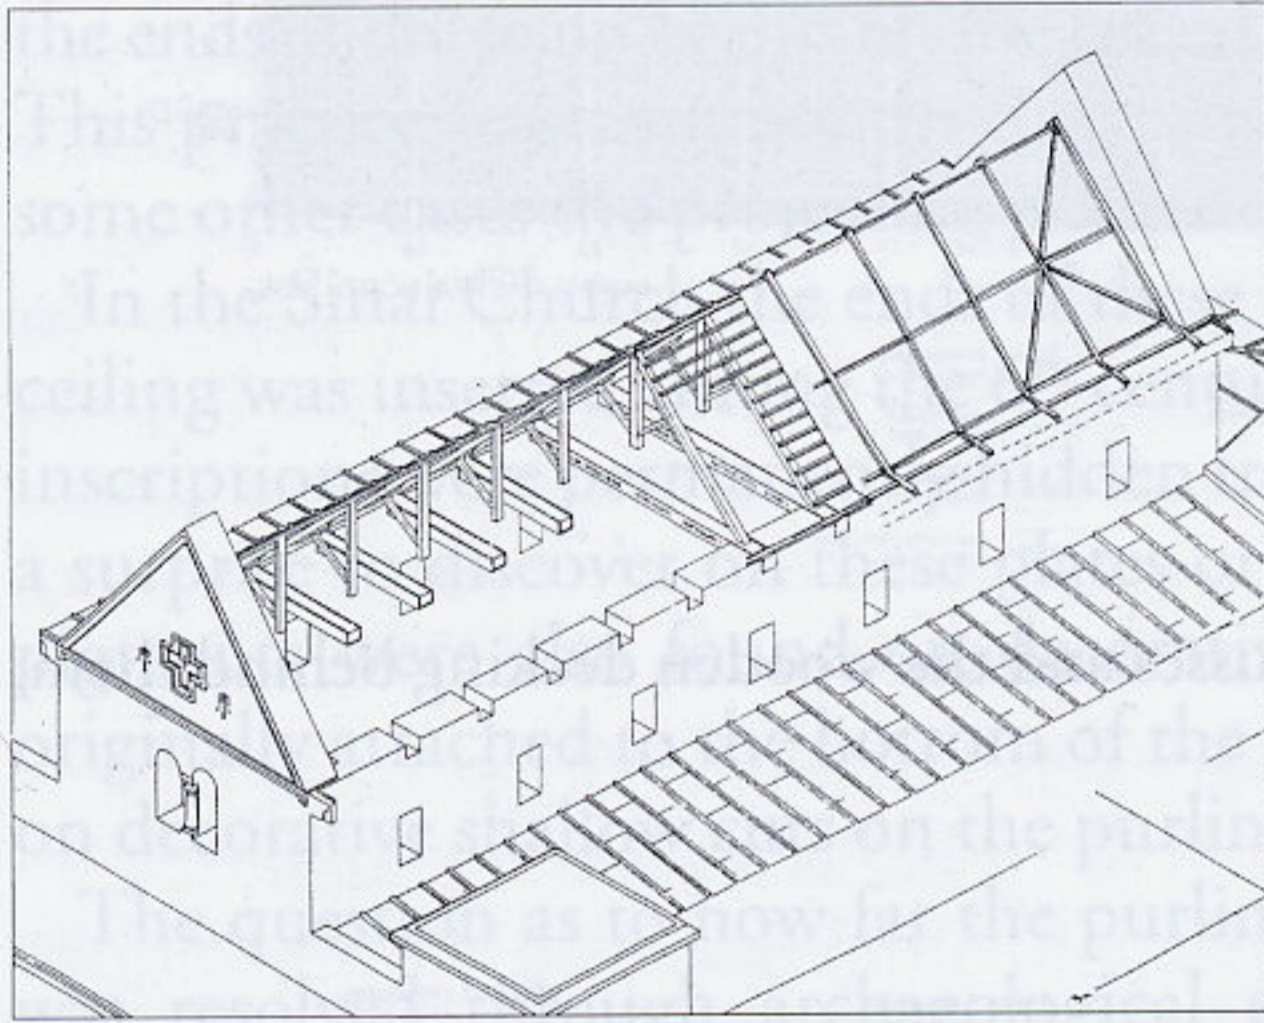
Isometric drawing of the raised central nave of St Catherine's Monastery Church indicating the proposed independent stainless-steel frame that would carry lead sheets load directly to the walls.
